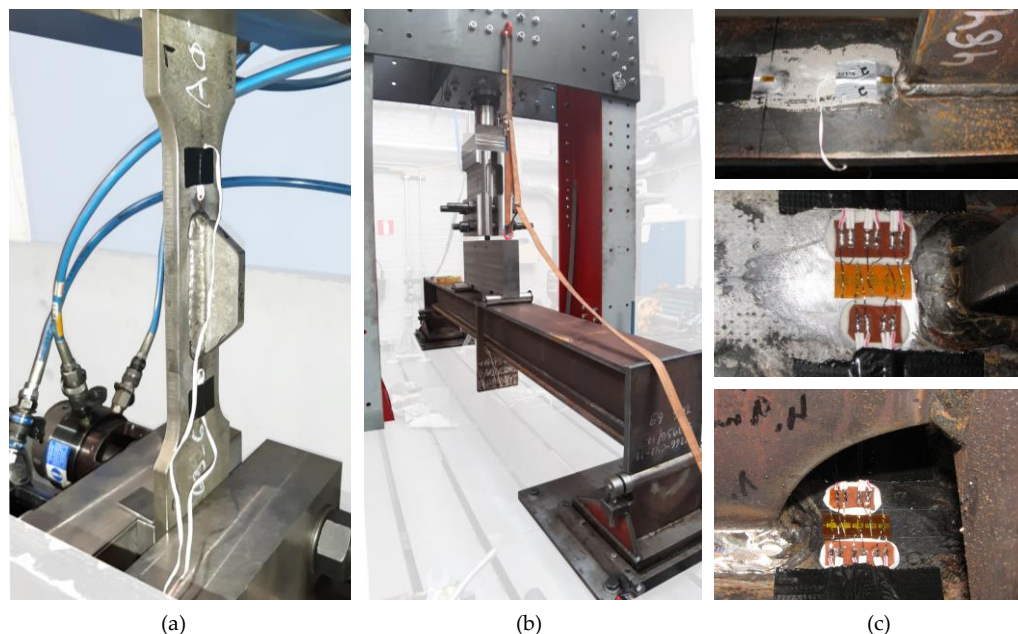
Fatigue testing equipment and instrumentation: fatigue tests of (a) the tensile specimens and (b) beam specimens, and (c) strain gage instrumentation.
